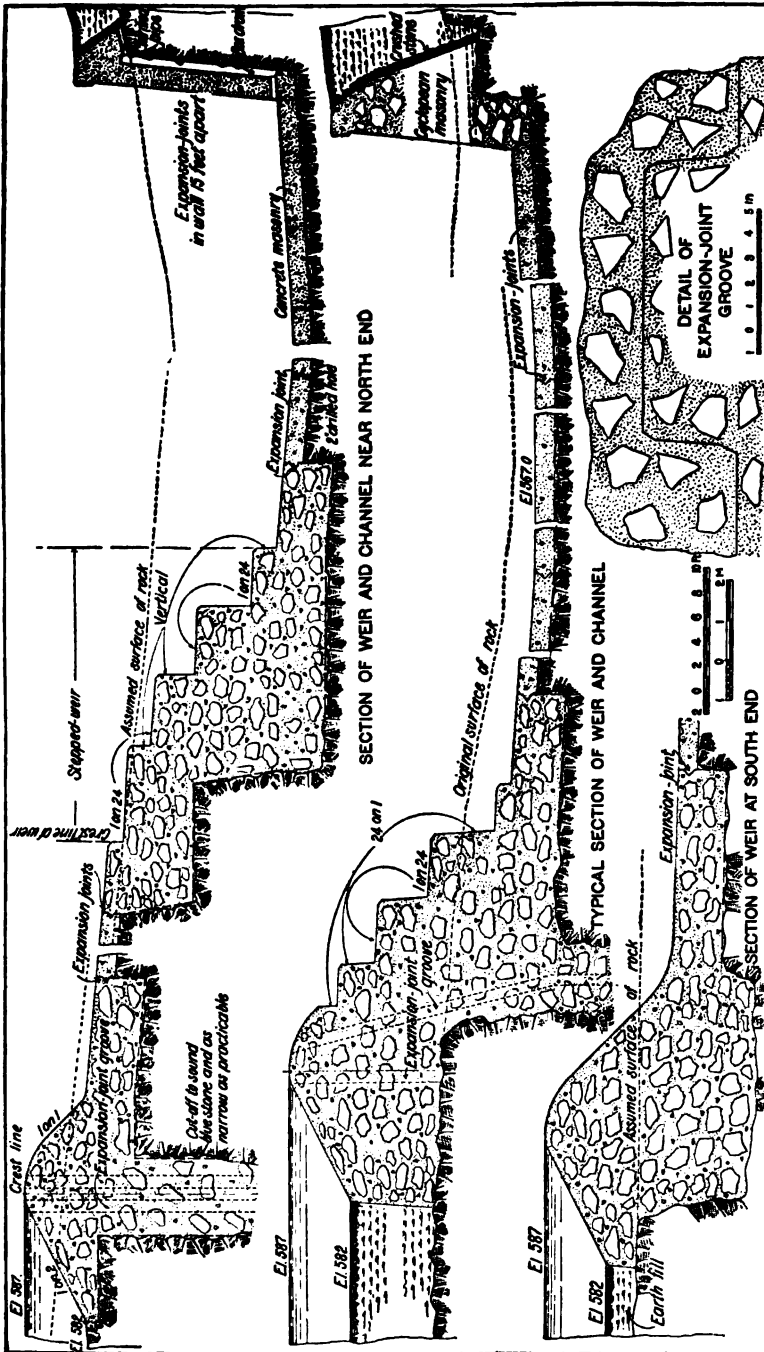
Waste Weir at Ashokan Reservoir. Typical Cross-sections.
